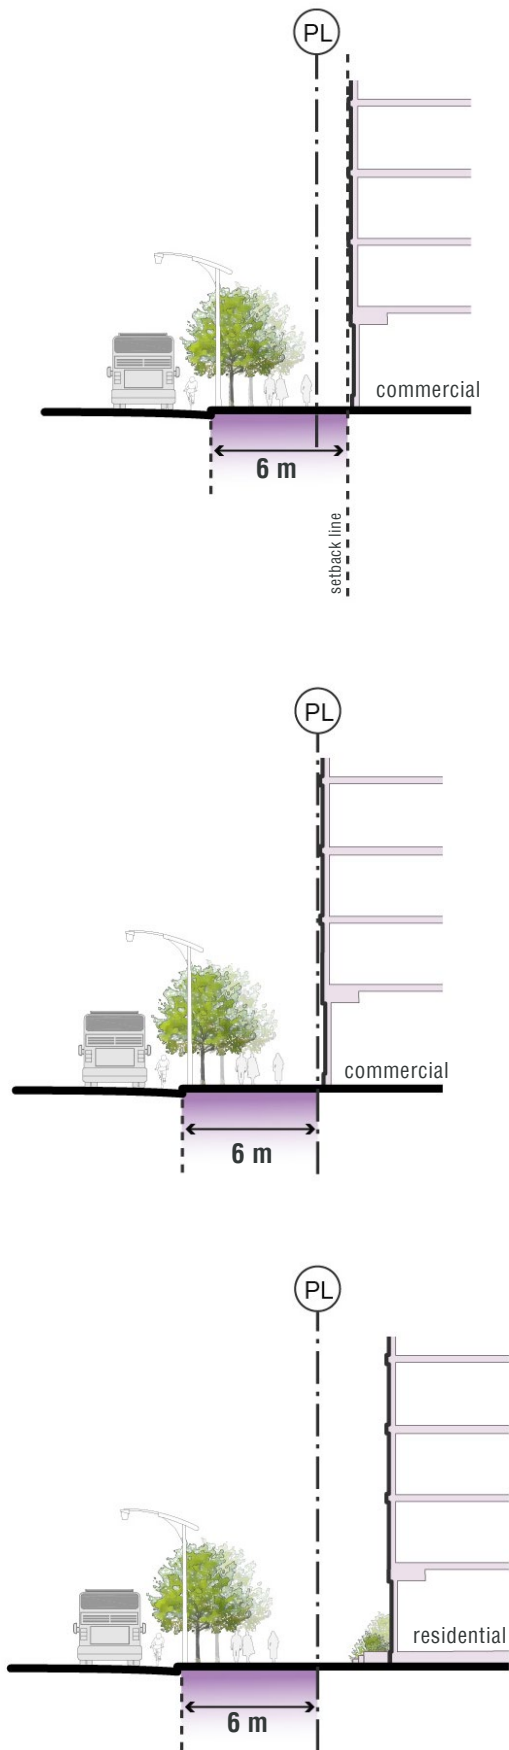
Examples of setback conditions with a minimum 6.0-metre sidewalk zone.
